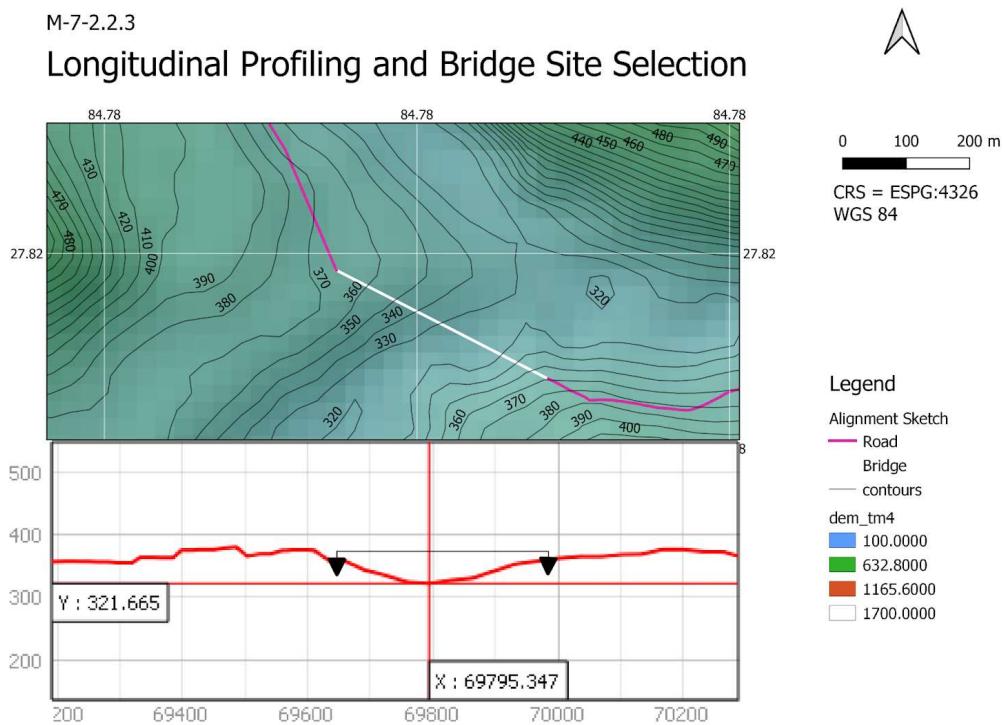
Longitudinal Profiling and Bridge Site Selection
